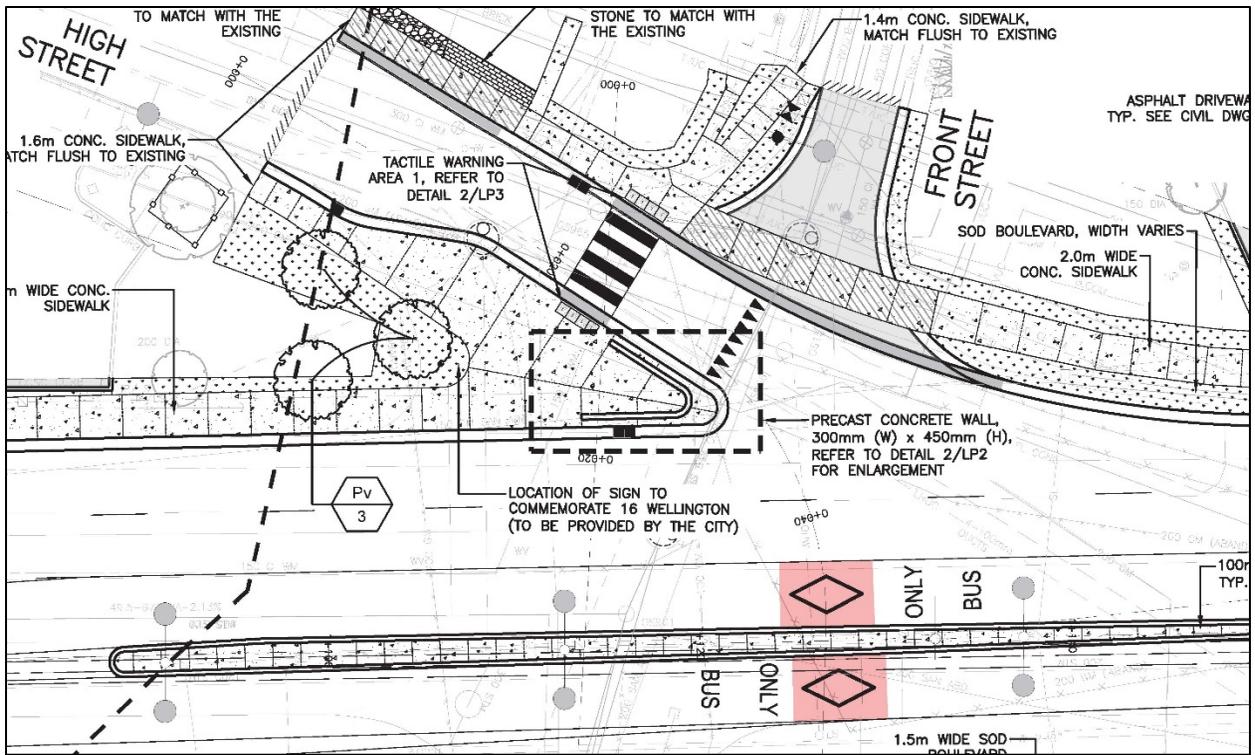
Detail from Wellington Gateway Construction Project Detail Design Drawings, showing proposed location of cultural heritage interpretive sign for the building at 16 Wellington Road (AECOM, Dillon Consulting, AGM, dated November 2023).
